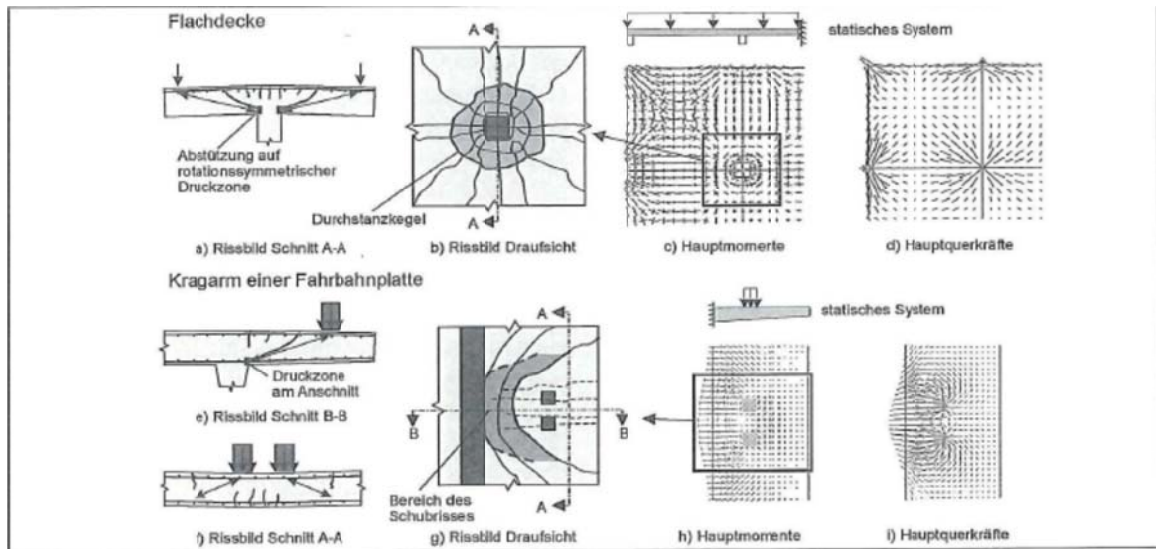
Bearing behavior and crack pattern at a column supporting a floor slab as well as for a cantilevering bridge deck slab under concentrated loads (Rombach et al. 2009)
